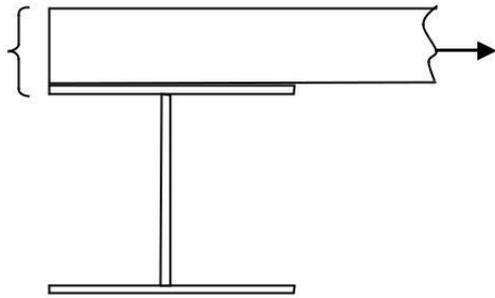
Shows testing arrangement for Simply Supported Specimen
